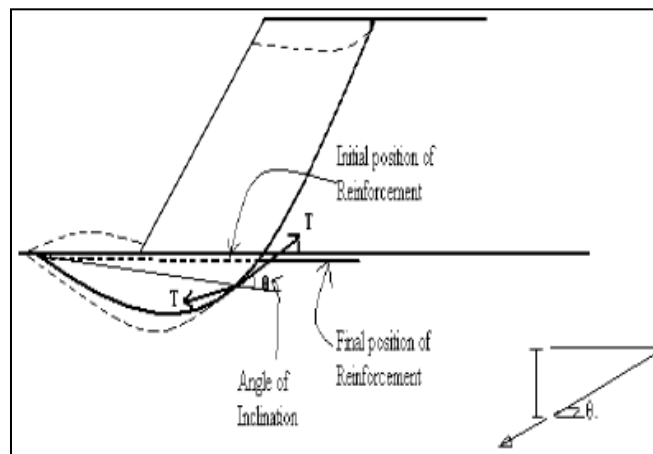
shows horizontal geosynthetic reinforcement between foundation soil and embankment fill. Layer spans embankment width and length. Fully mobilising shear resistance at the basal reinforcement surface is assumed.
